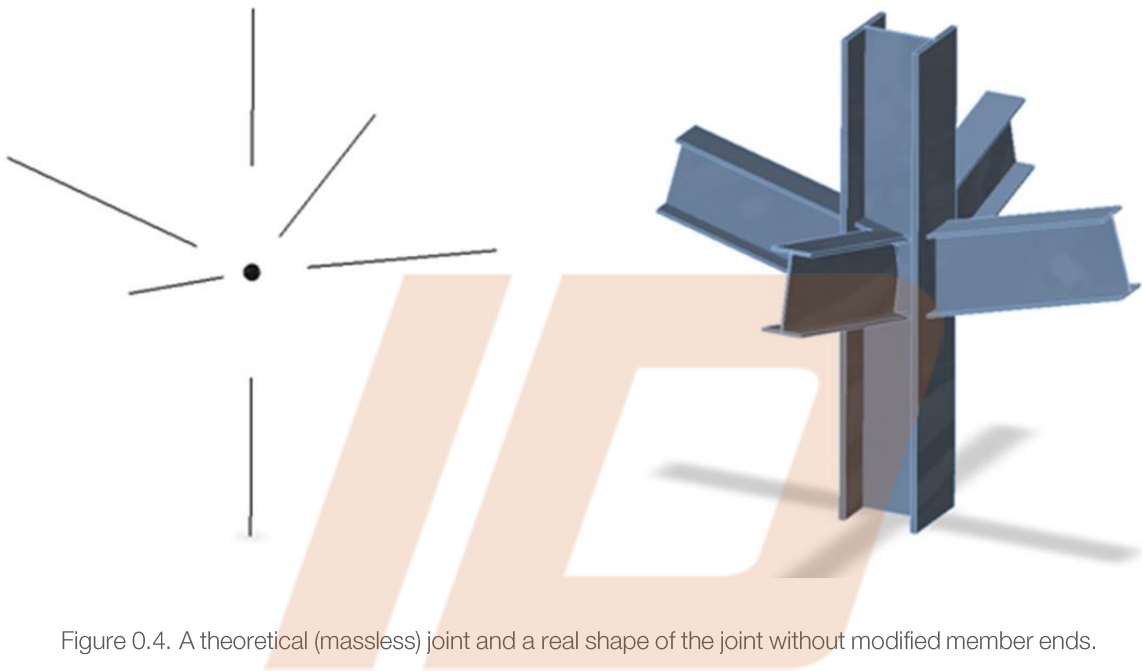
A theoretical (massless) joint and a real shape of the joint without modified member ends.
